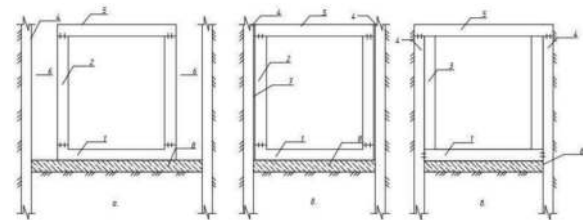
Variety of methods of construction of underground structures made of cast reinforced concrete: *a* – cut and cover method with backfill slots; *b* – cut and cover method without backfill slots; *c* – cut and cover and semi-closed-cut method with slab (cover) spacing discs, with a load-bearing ‘diaphragm wall’; 1 – buckle (foundation) slab; 2 – bearing wall; 3 – pressure wall; 4 – excavation wall (in part *b* – bearing structure); 5 – floor slab (cover); 6 – cavities for backfilling; 7 – sliding plane (plane of mutual shift of the walls); 8 – concrete foundation mattress.
